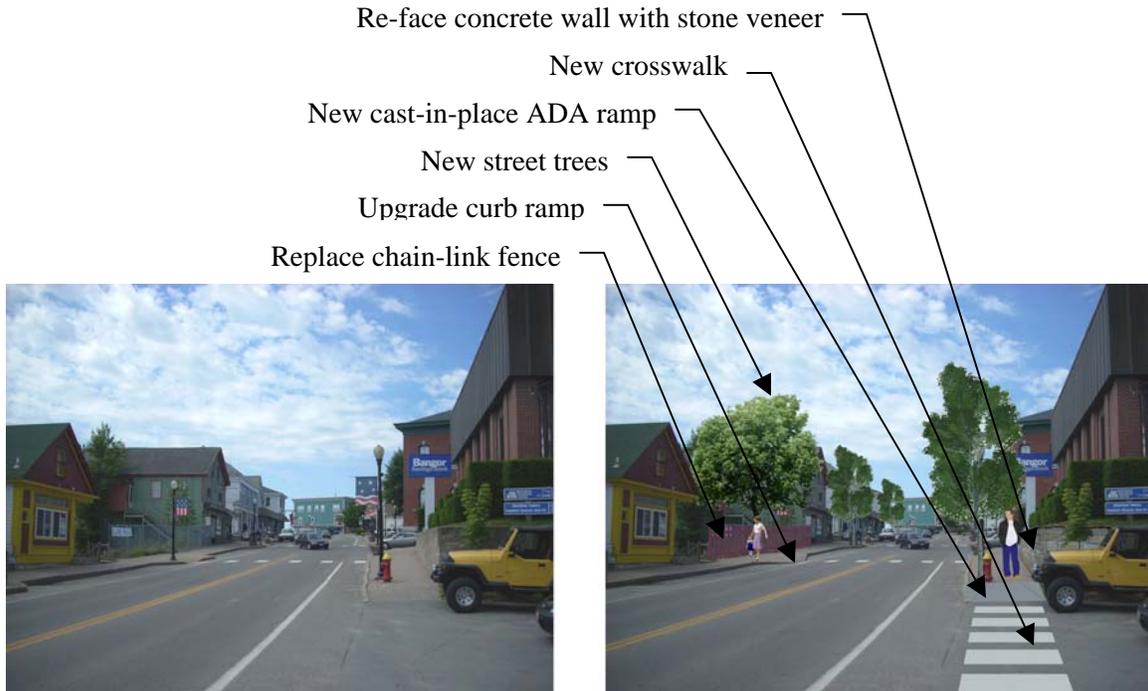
Existing and proposed conditions of downtown Main St. Downtown improvements include re-facing concrete wall in front of Bangor Savings Bank, replacing chain-link fence on opposite side of street, removing mid-block curb extensions, and adding street trees.
